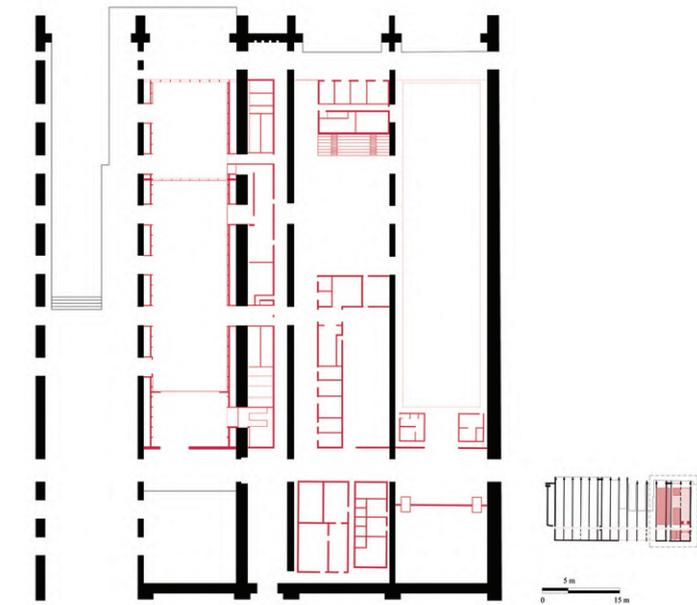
| Alvéoles 12-14 Cultural Centre: redrawing ground floor (credit: E. Guidetti, 2021).
